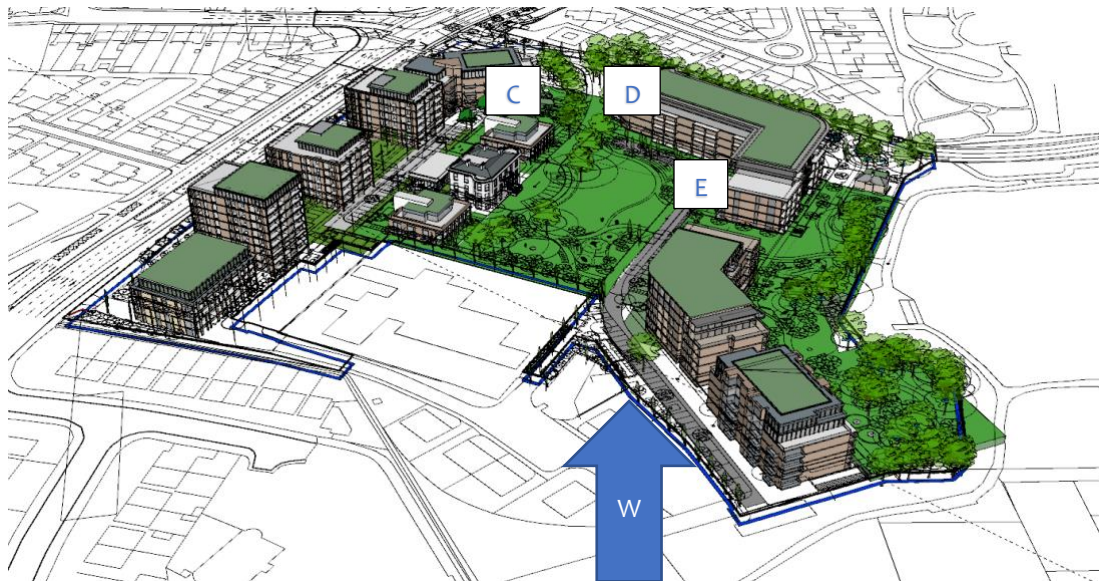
Flow around the Buildings at St. Teresa's House for Wind from Southwest
